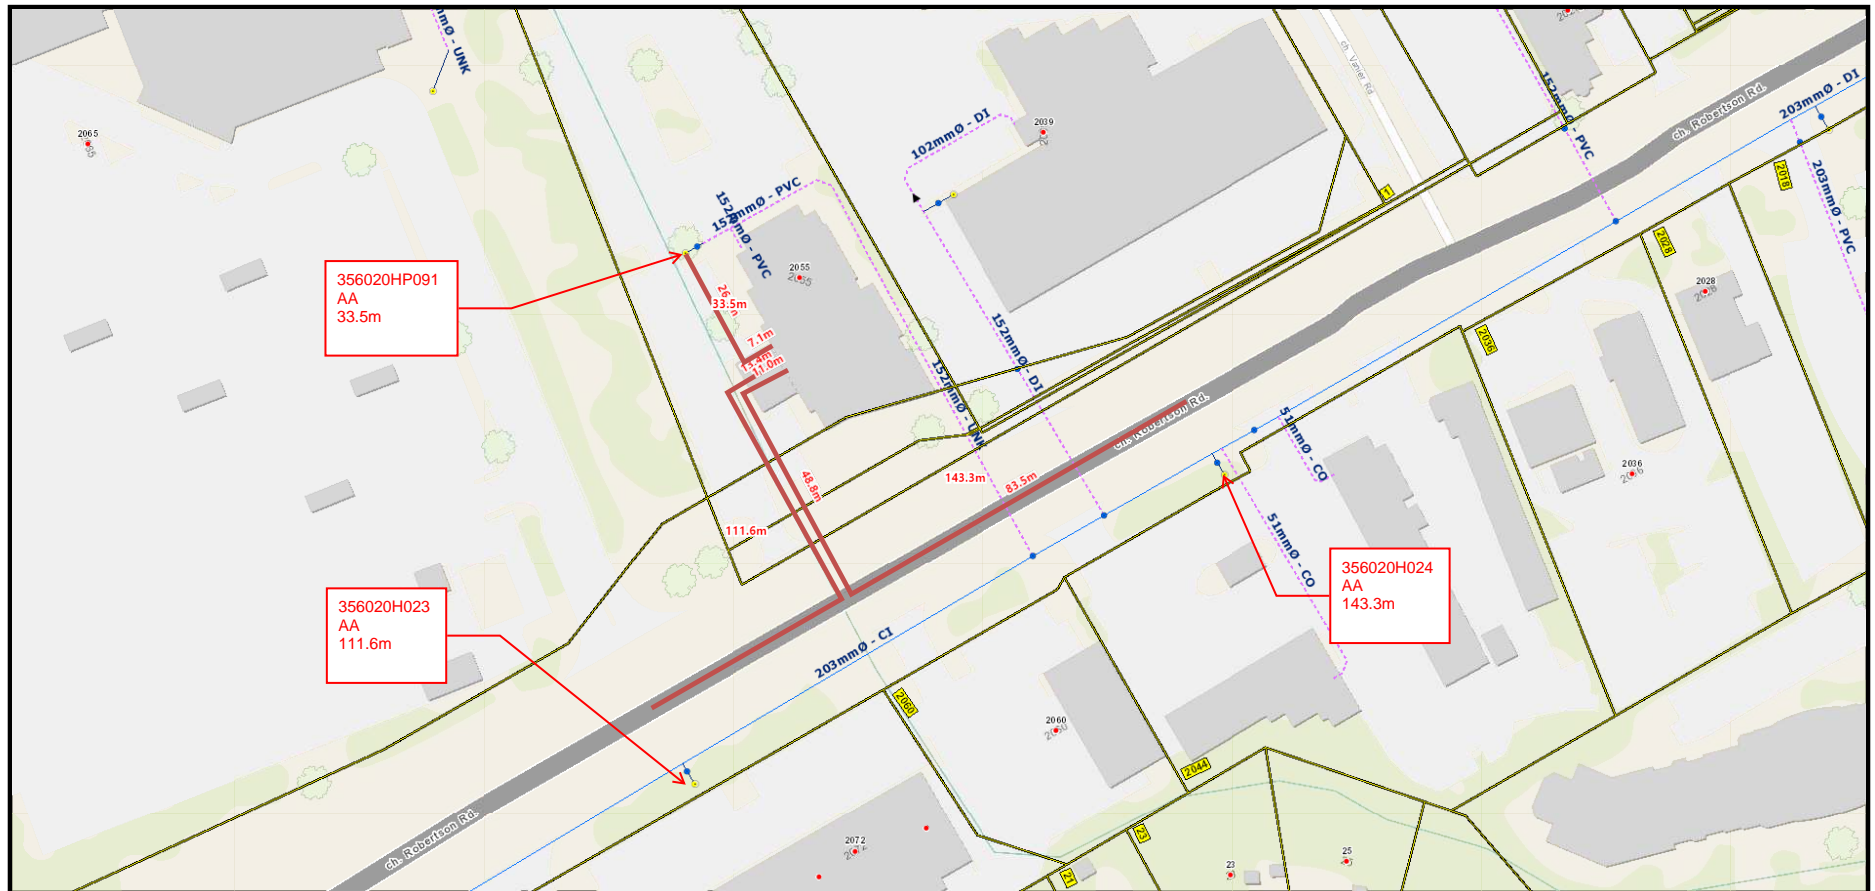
Hydrant Location Plan - 2055 Robertson Road.
